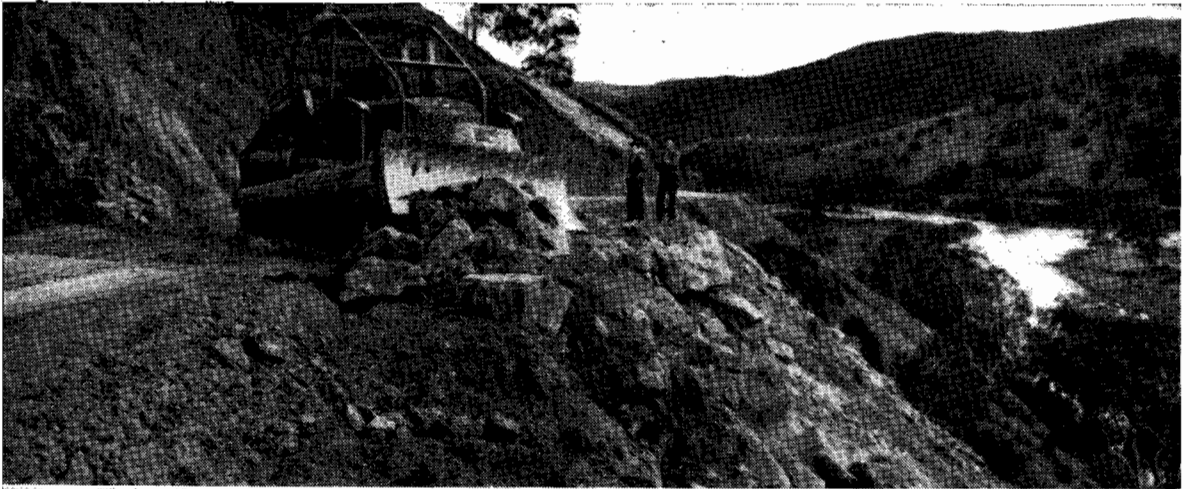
Realigned and reconstructed section of Grampians Road approx. 6 miles west of Hall's Gap.
